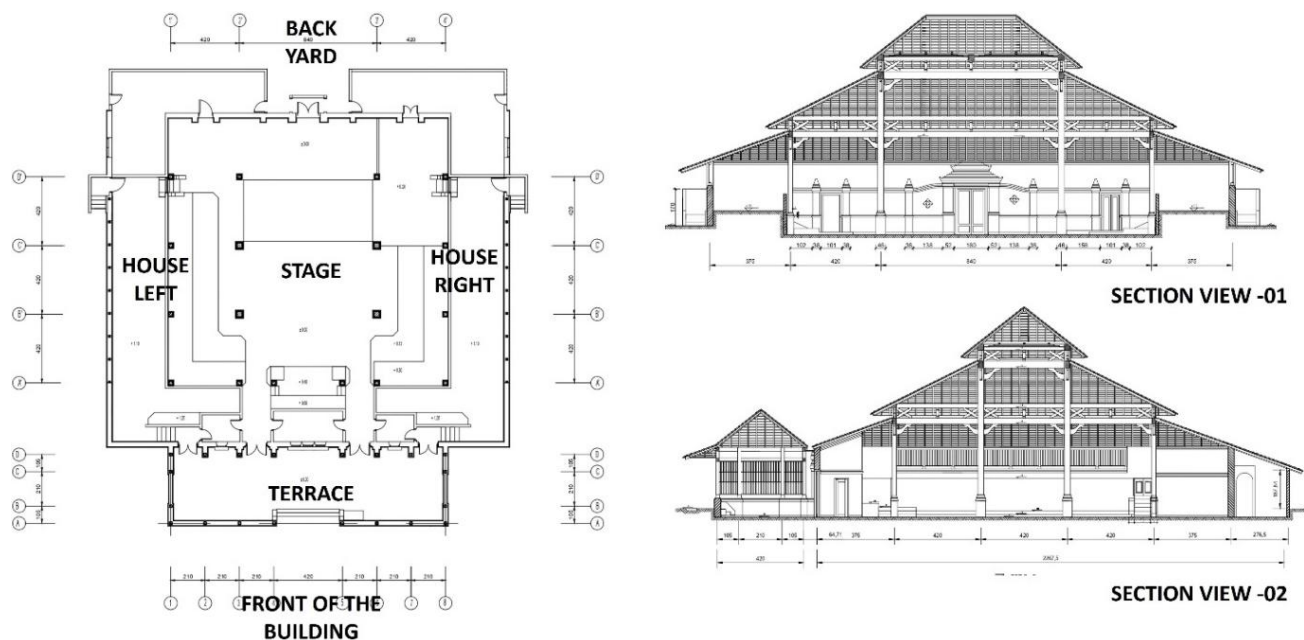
Building geometry, floor plan, section, and principal ventilation elements
